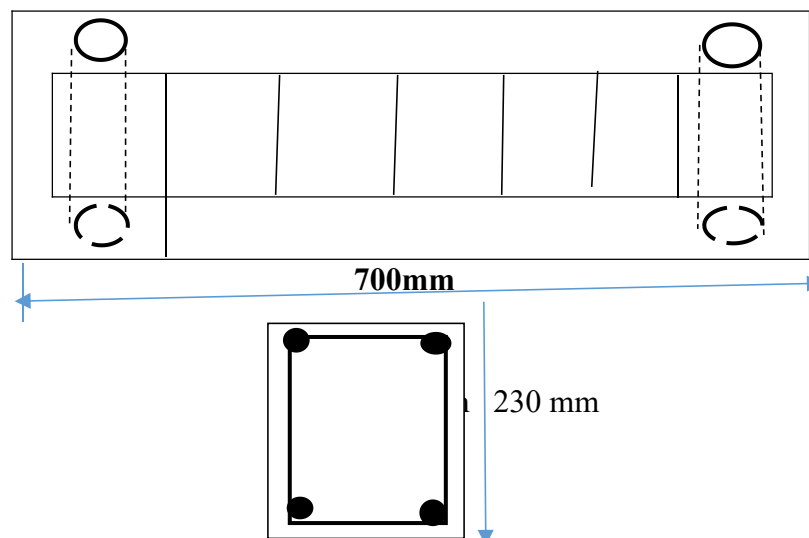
Longitudinal and cross section details of beam with vertical circular opening
